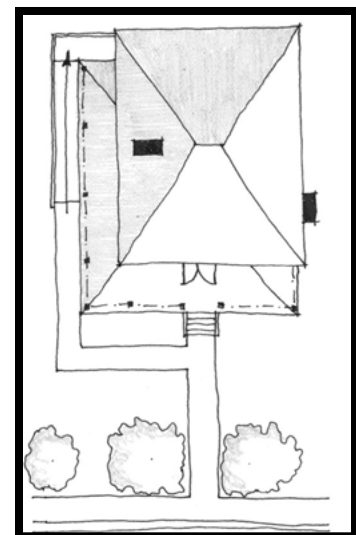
ACCESS RAMPS SHOULD BE LOCATED ON REAR OR SIDE ELEVATIONS.
